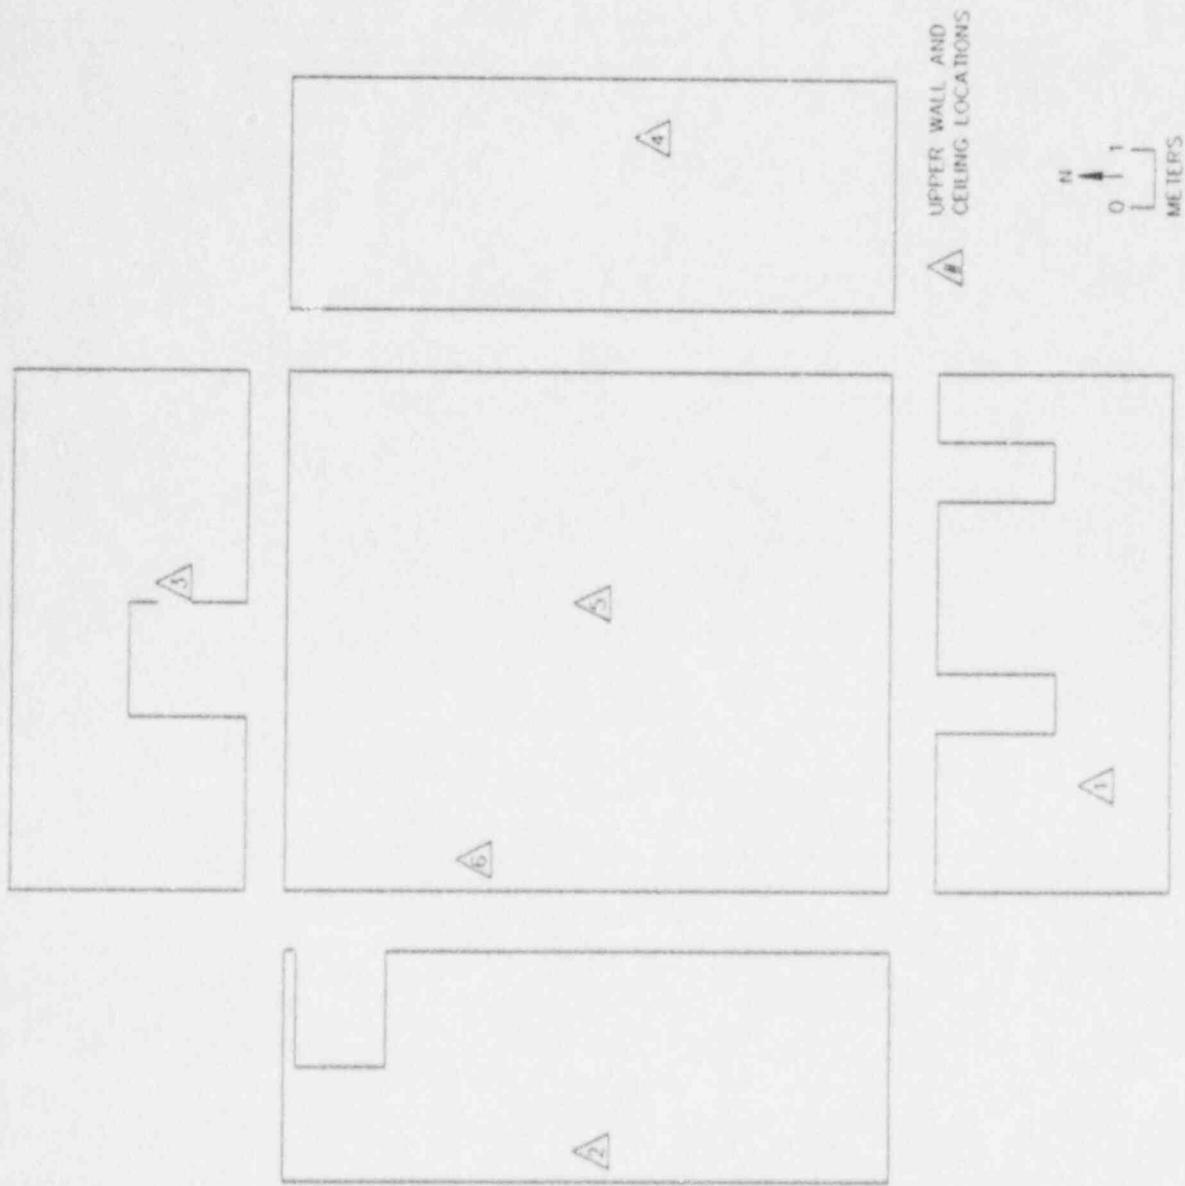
Room 43 Showing Locations of Upper Wall and Ceiling Single-point Measurements
